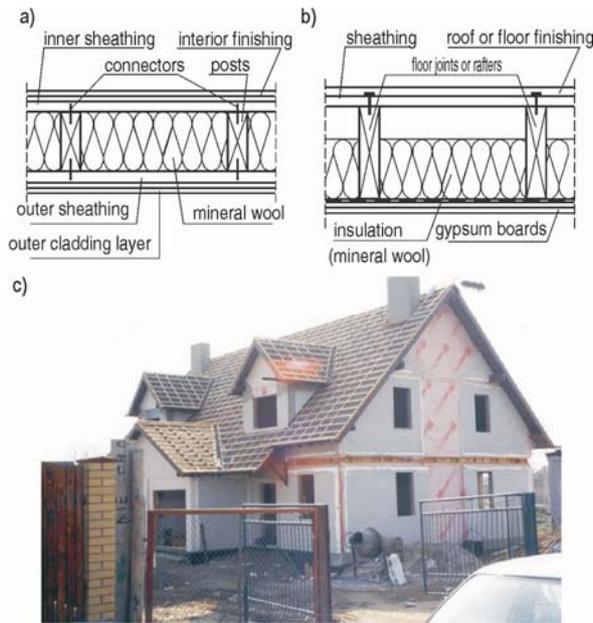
Typical cross-section of the wood-framed structures and a building under construction: a) wall diaphragms, b) floor and roof panel, c) a building under construction
